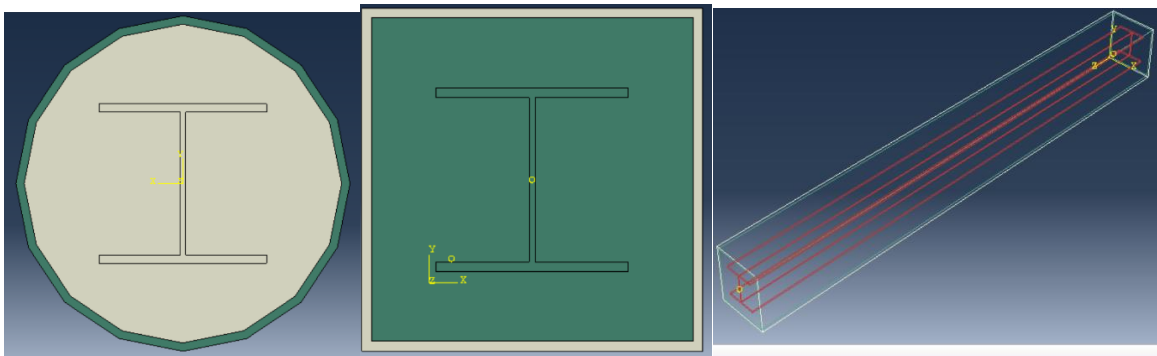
Circular and square concrete-filled steel tube with steel profile embedded
